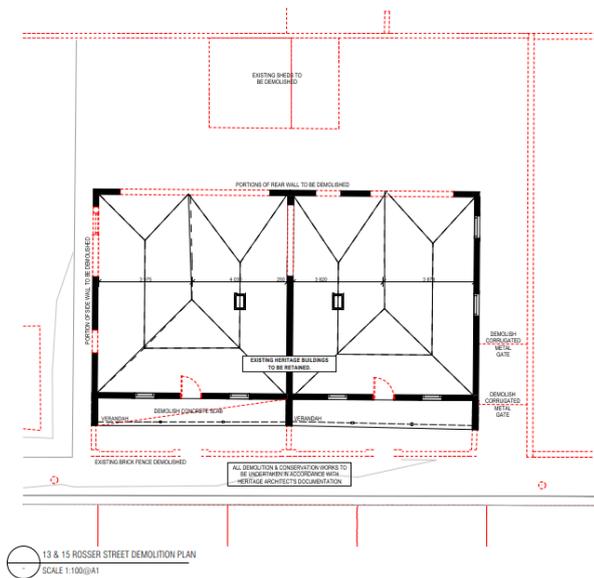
Excerpt Architectural Plans - 13-15 Rosser Street Demolition Plans (Fieldwork)
